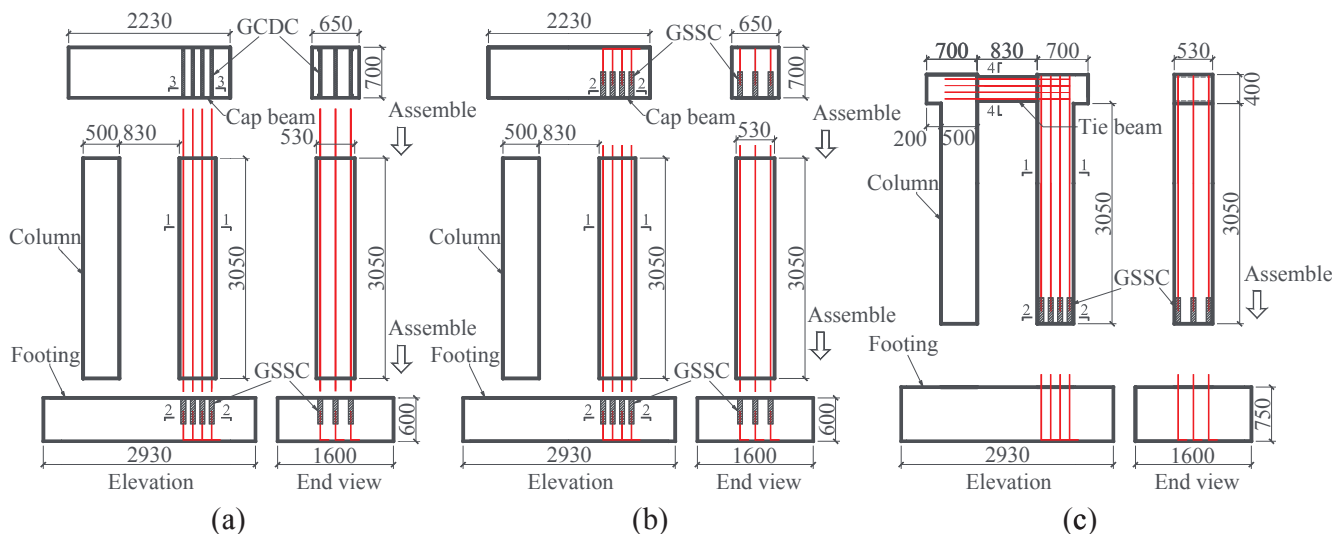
Dimensional and structural details of frame pier specimens: (a) Specimen #1; (b) Specimen #2; (c) Specimen #3.
